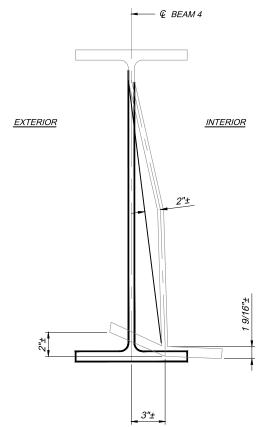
BEAM 4 - BOTTOM FLANGE DAMAGE
